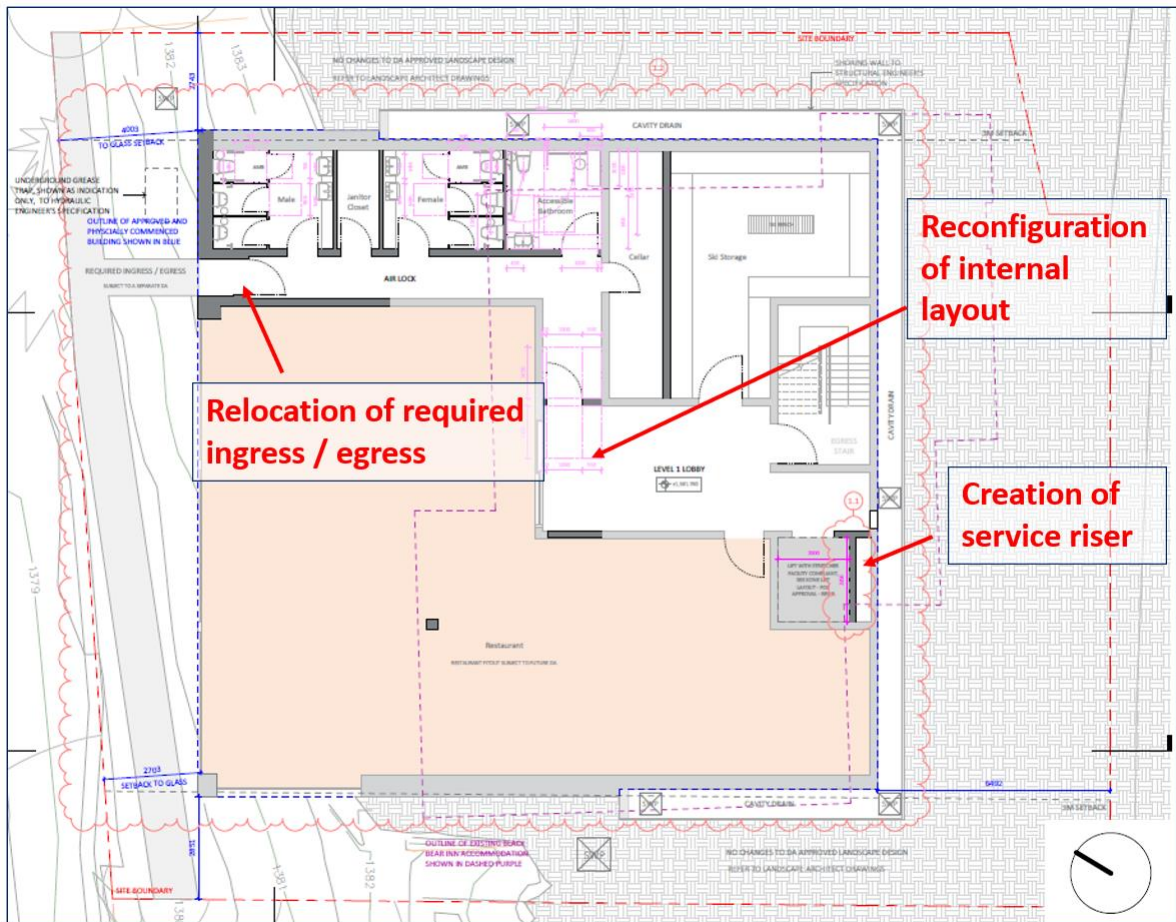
| Proposed Level 1 reconfiguration (Source: Applicant's SEE 2023)
